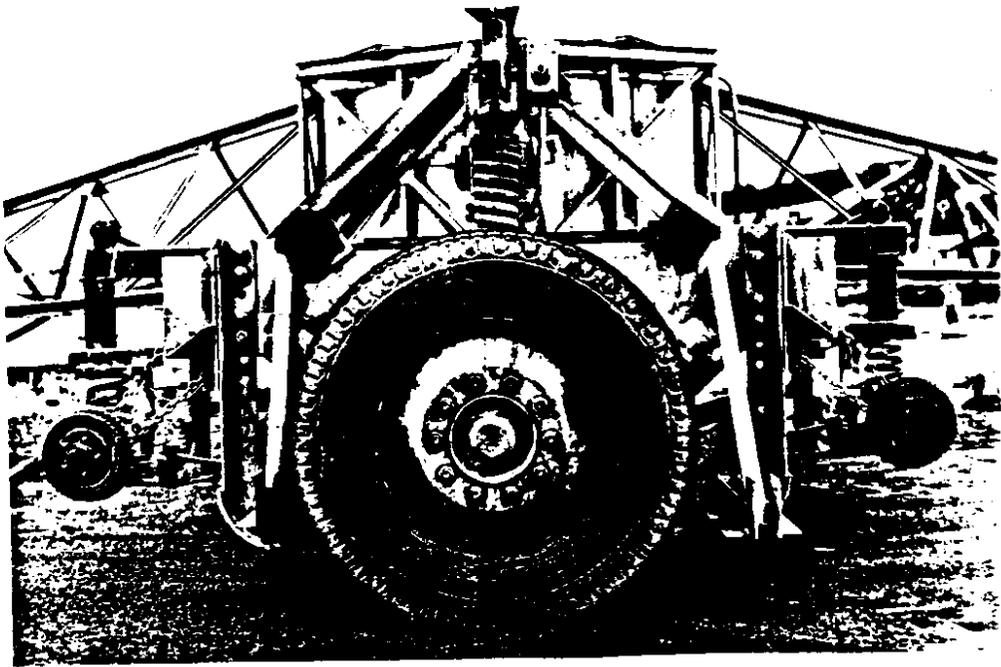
One of three Sets of Dual tires Used to Apply Loads to Test Pavements
